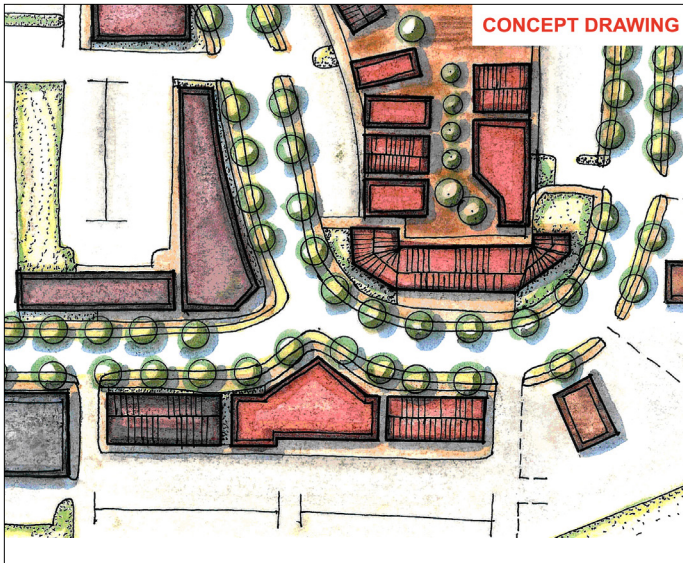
Concept drawing showing recommended limited vehicular access and buildings located close to the street
